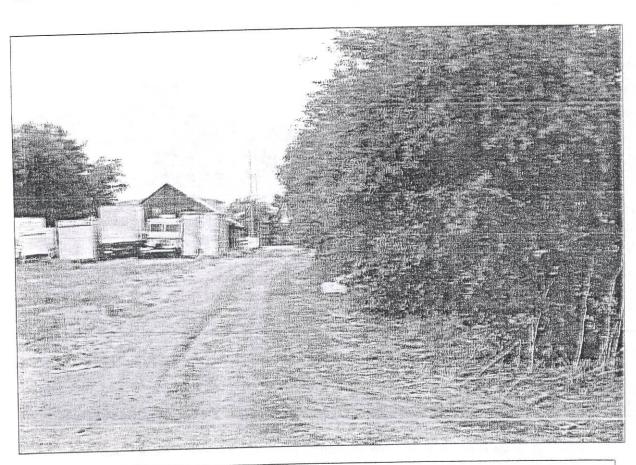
Photo B. Access road to Escalon-Beliota Road from Well Site A-water line will go down center of road.
